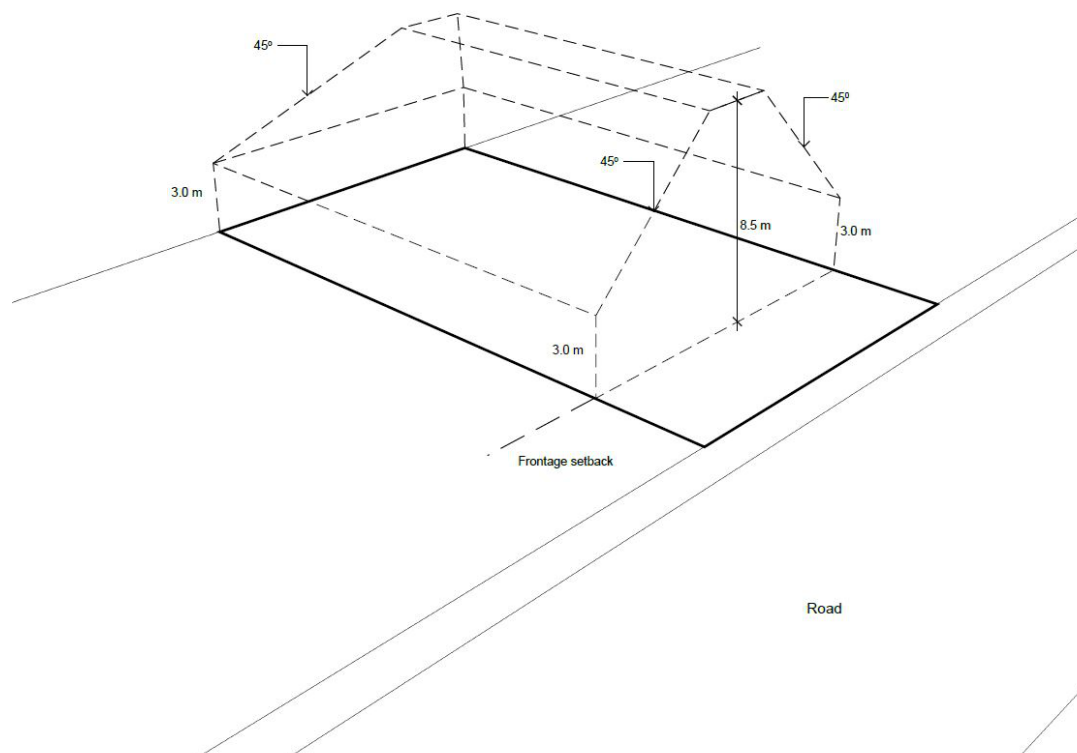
Building envelope as required by clause 10.4.2 A3(a)
